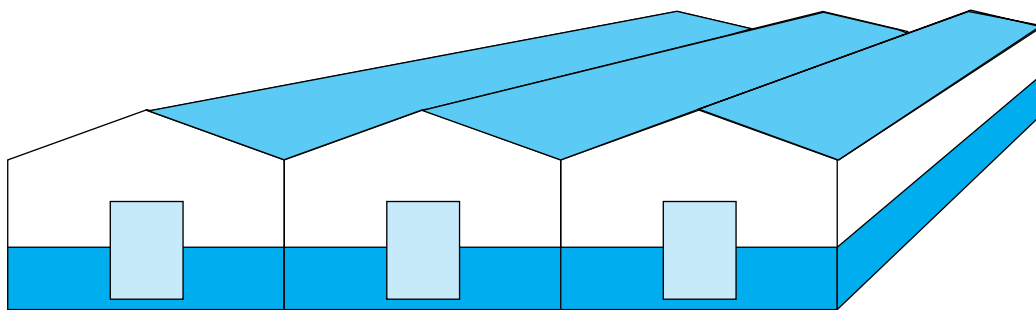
A ridge-and-furrow greenhouse range.
